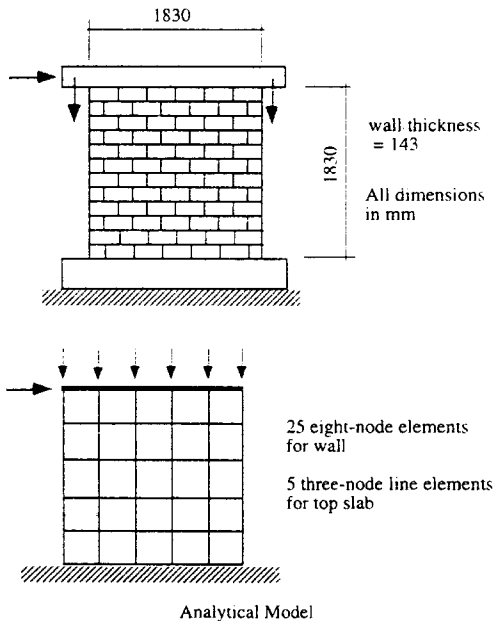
Reinforced concrete masonry wall tested by Shing et al.
